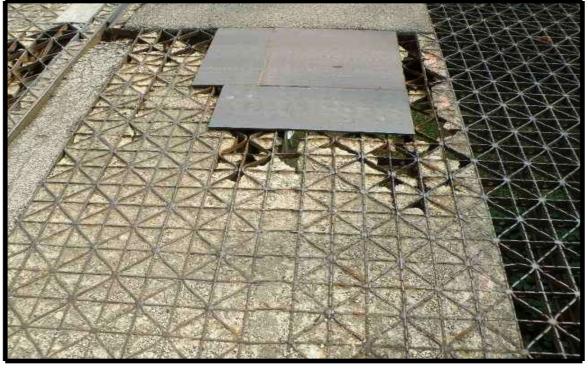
TEMPORARY REPAIRS TO GRID DECK @ PIER ONE
